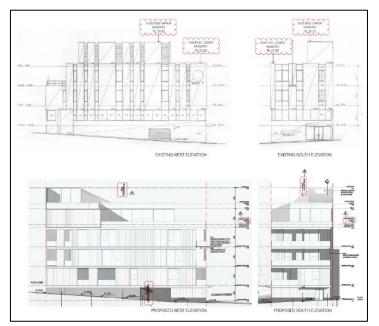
existing (top) and proposed (bottom) west and south elevations (Source: Urban Context Report)
